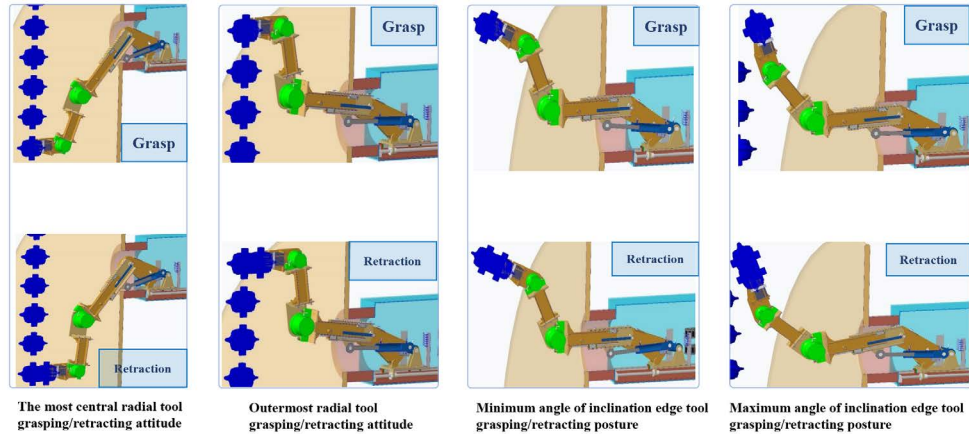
Demonstration of cutter replacement process for multiple tool locations
